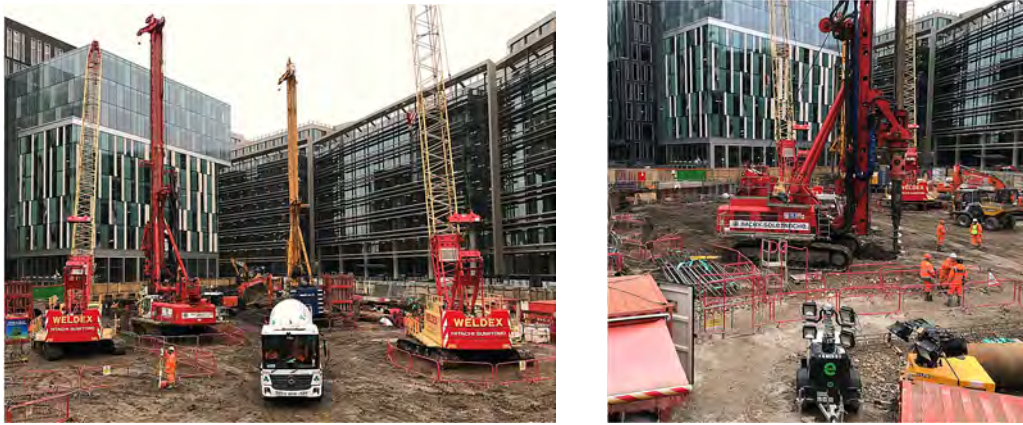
Installation of LDA and CFA piles between the tunnels
